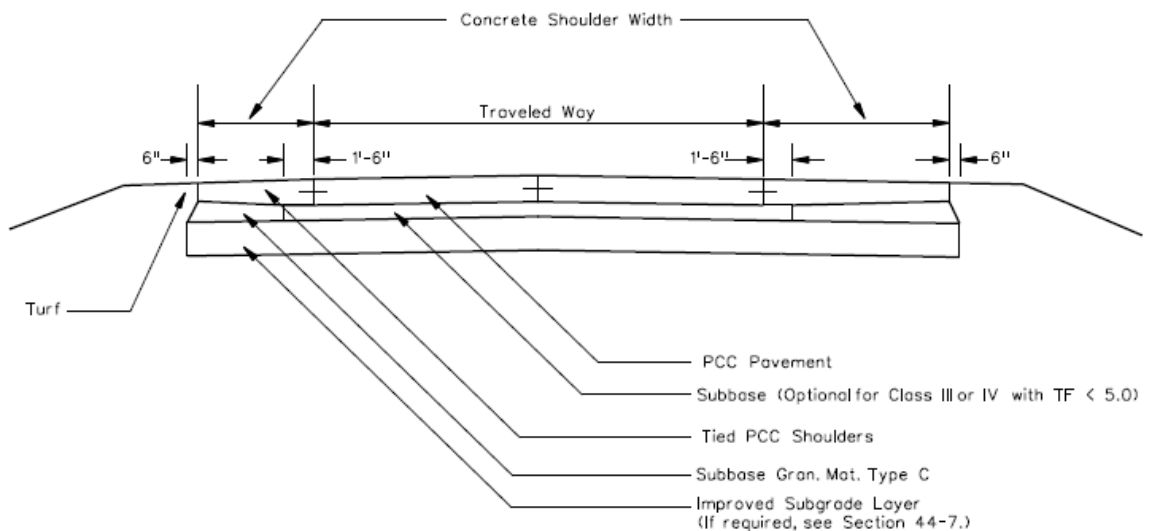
Typical rigid pavement design with tied shoulder (Illinois DOT 2021).
